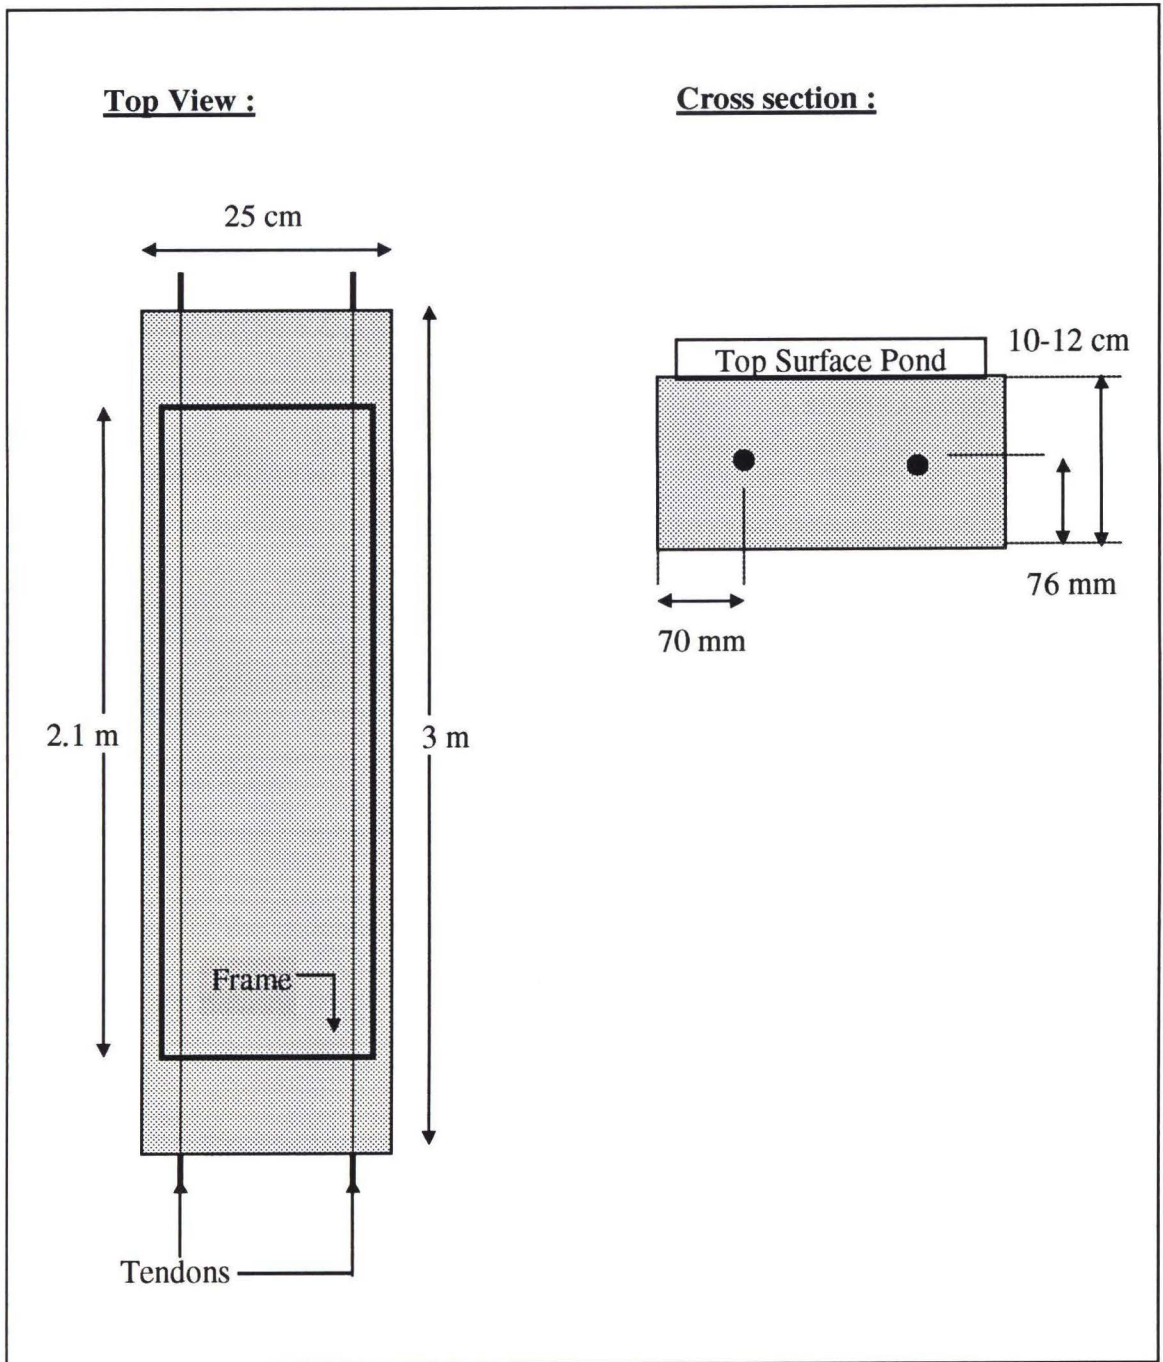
Schematic illustration of a pre-stressed concrete beam specimen and sea water electrolyte pond.
